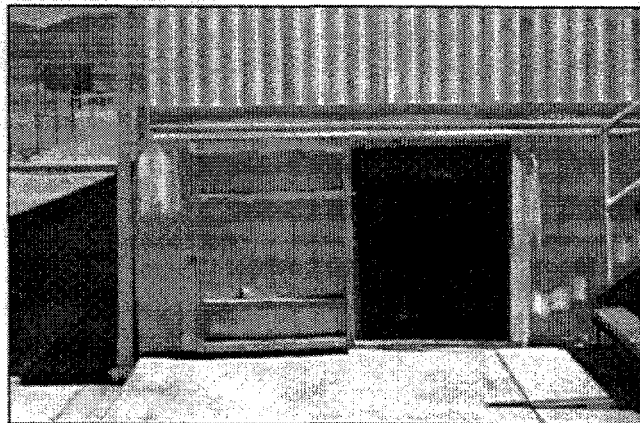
Example of a Raised Floor as an Area of Restricted Passage
